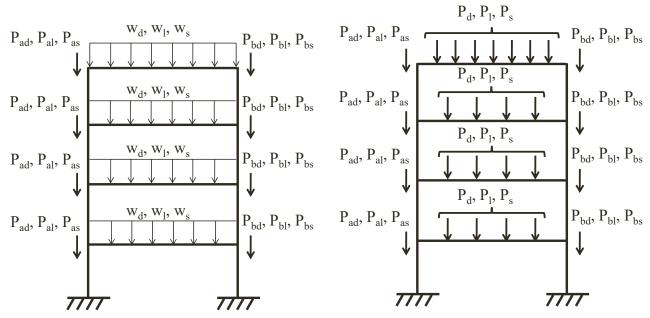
Gravity loads on frames with a) uniform loads on beams and b) concentrated loads on beams
